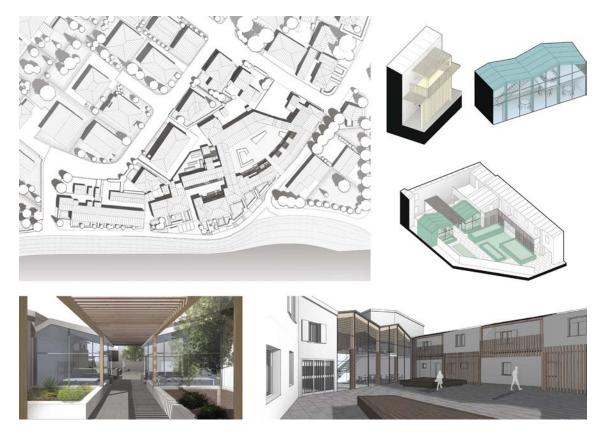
Filippo Baldan, Marco Baratto, urban regeneration design of the Noventa Padovana old village near the Piovego bridge: general plan; the three new architectural elements, the multifunctional collective building, the wooden porch, the social gardens; view towards the new courtyard of the social gardens; view of the main courtyard towards the multifunctional collective building.
